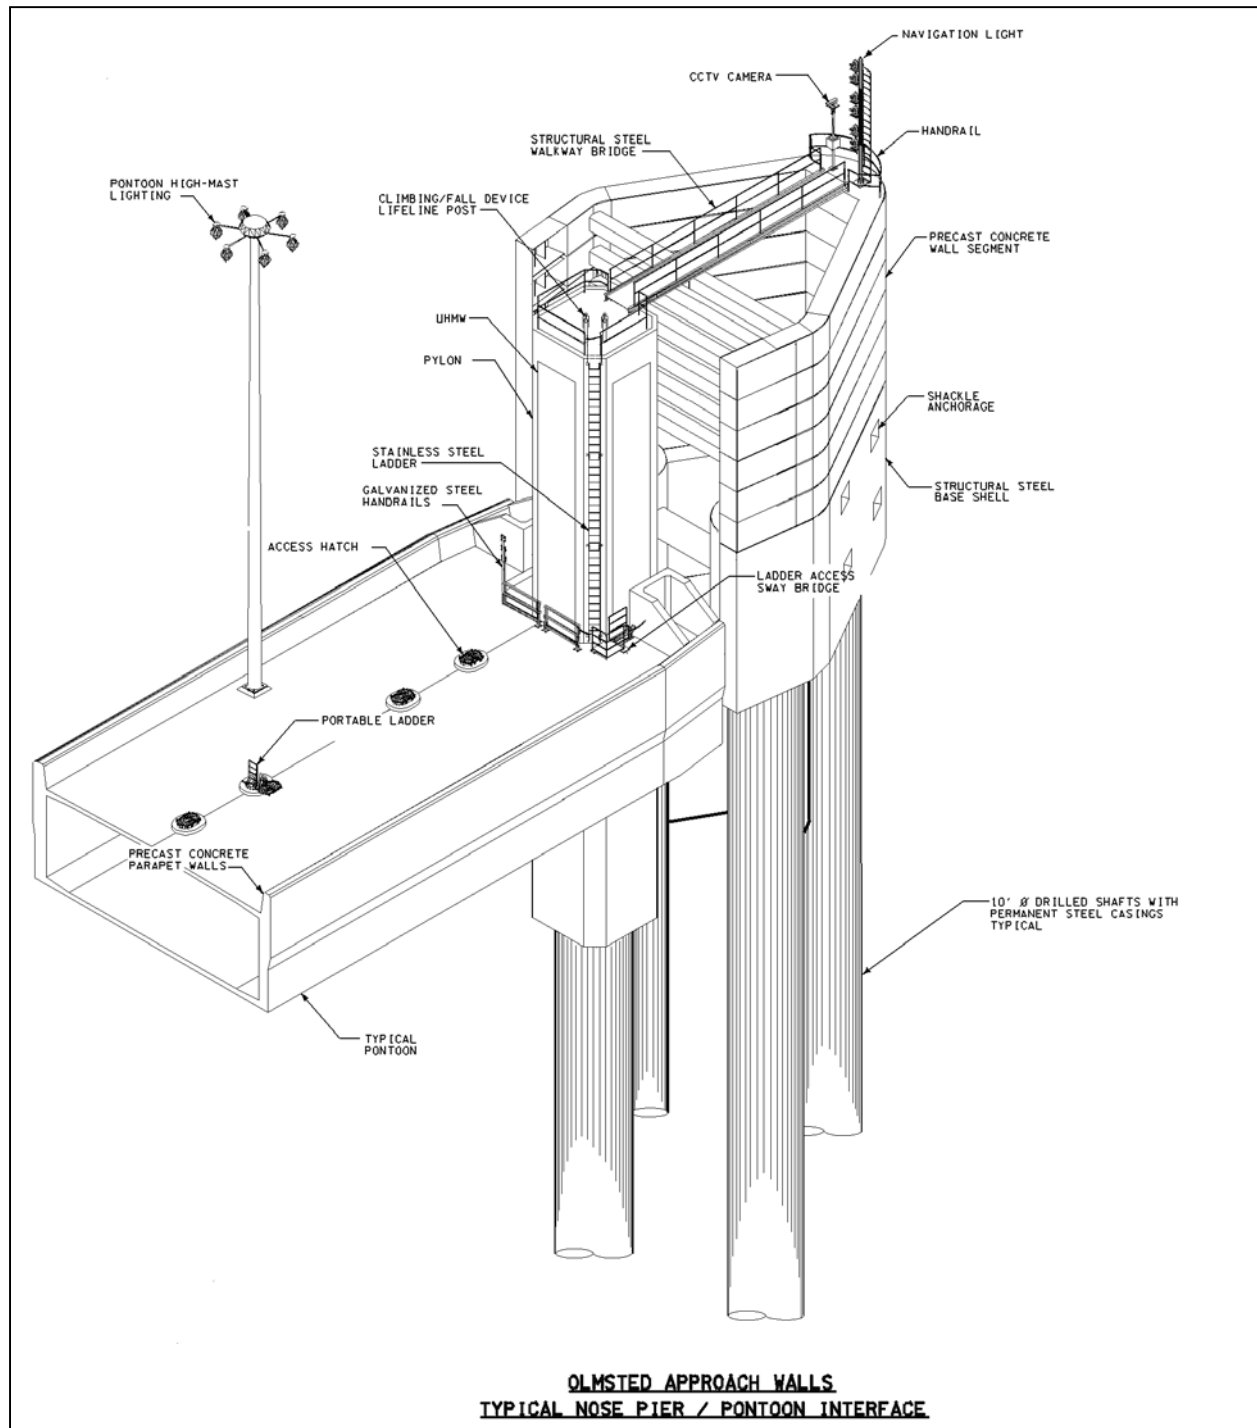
Detail view of floating approach wall connection to nose pier, Olmsted approach walls. Approach wall is a hollow precast concrete shell fabricated offsite and connected to preinstalled piers
